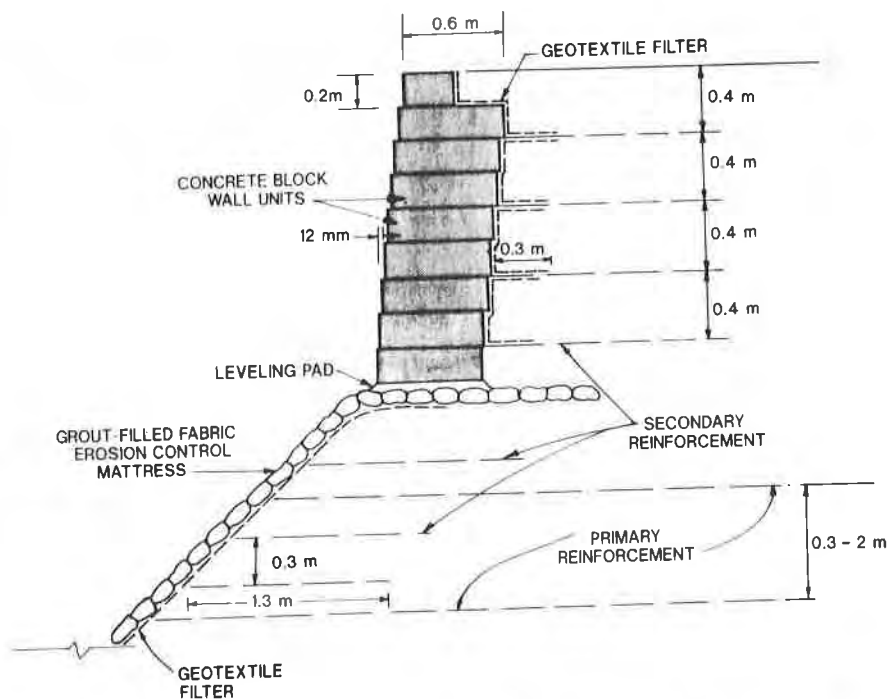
Detail showing the reinforced soil diversion channel slope and retaining wall, and the grout-filled fabric erosion control mattress.
